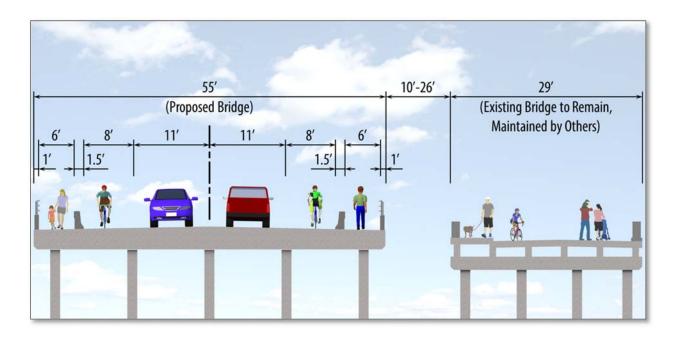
BUILD ALTERNATIVE 3 - BRIDGE TYPICAL SECTION
